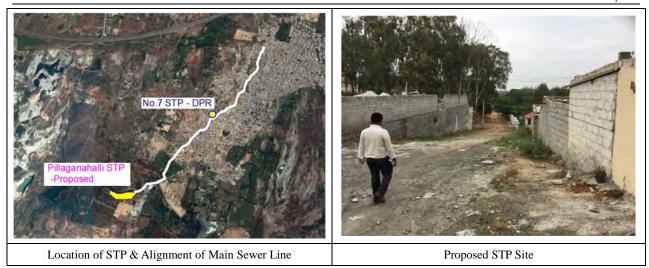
Location of No.7 STP and Alignment of Main Sewer Line
